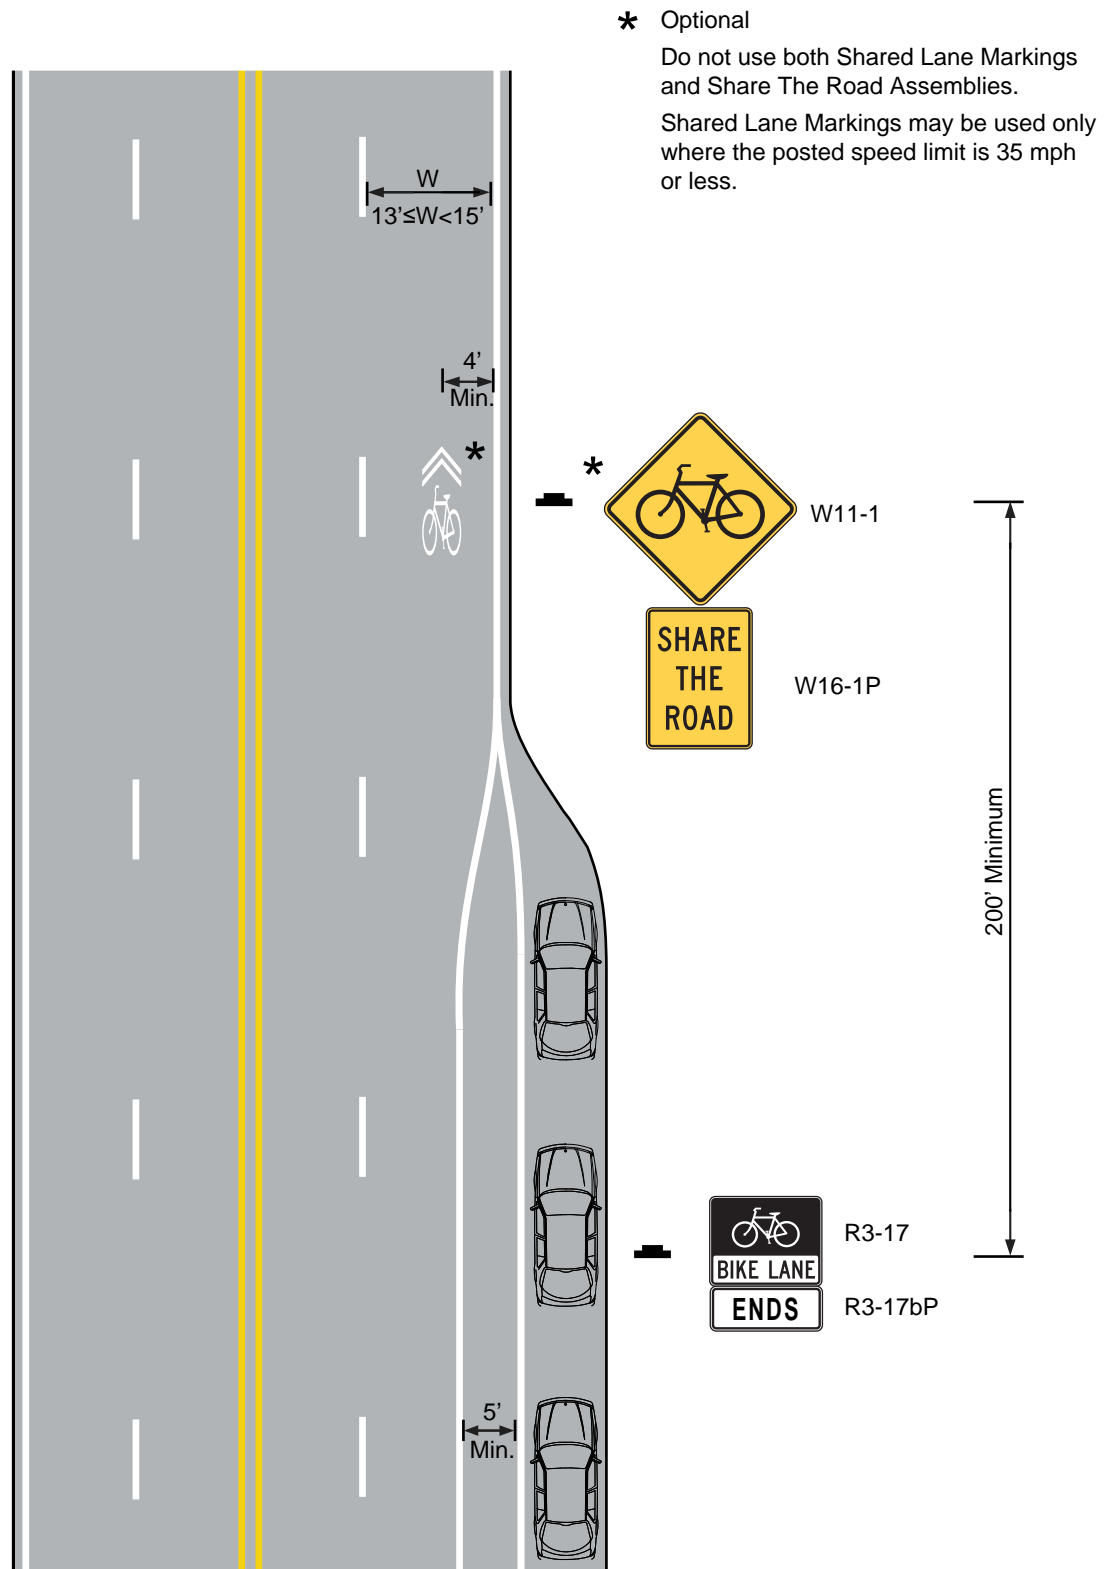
Example of Typical Transition from BIKE LANE with Parking to Shared Lane with Parking
